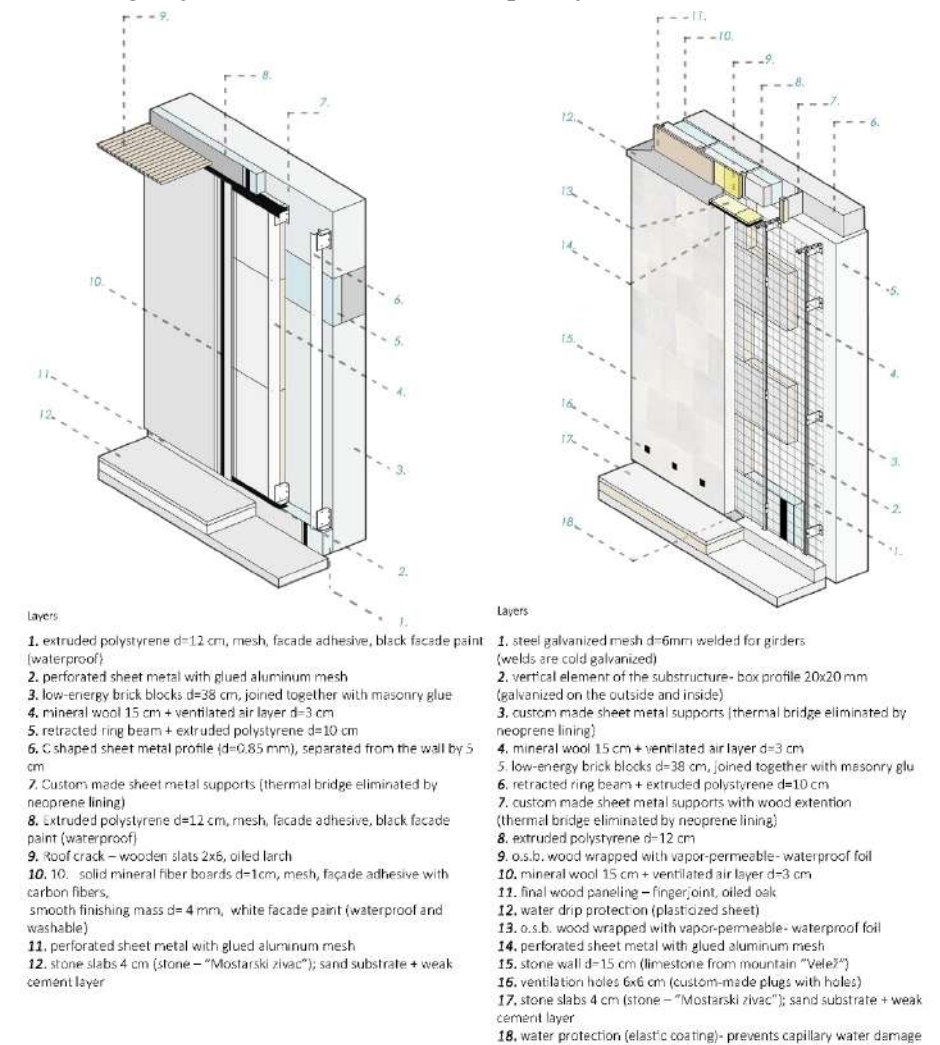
House VLHS, ventilated façade details © Vedad Islambegović.
